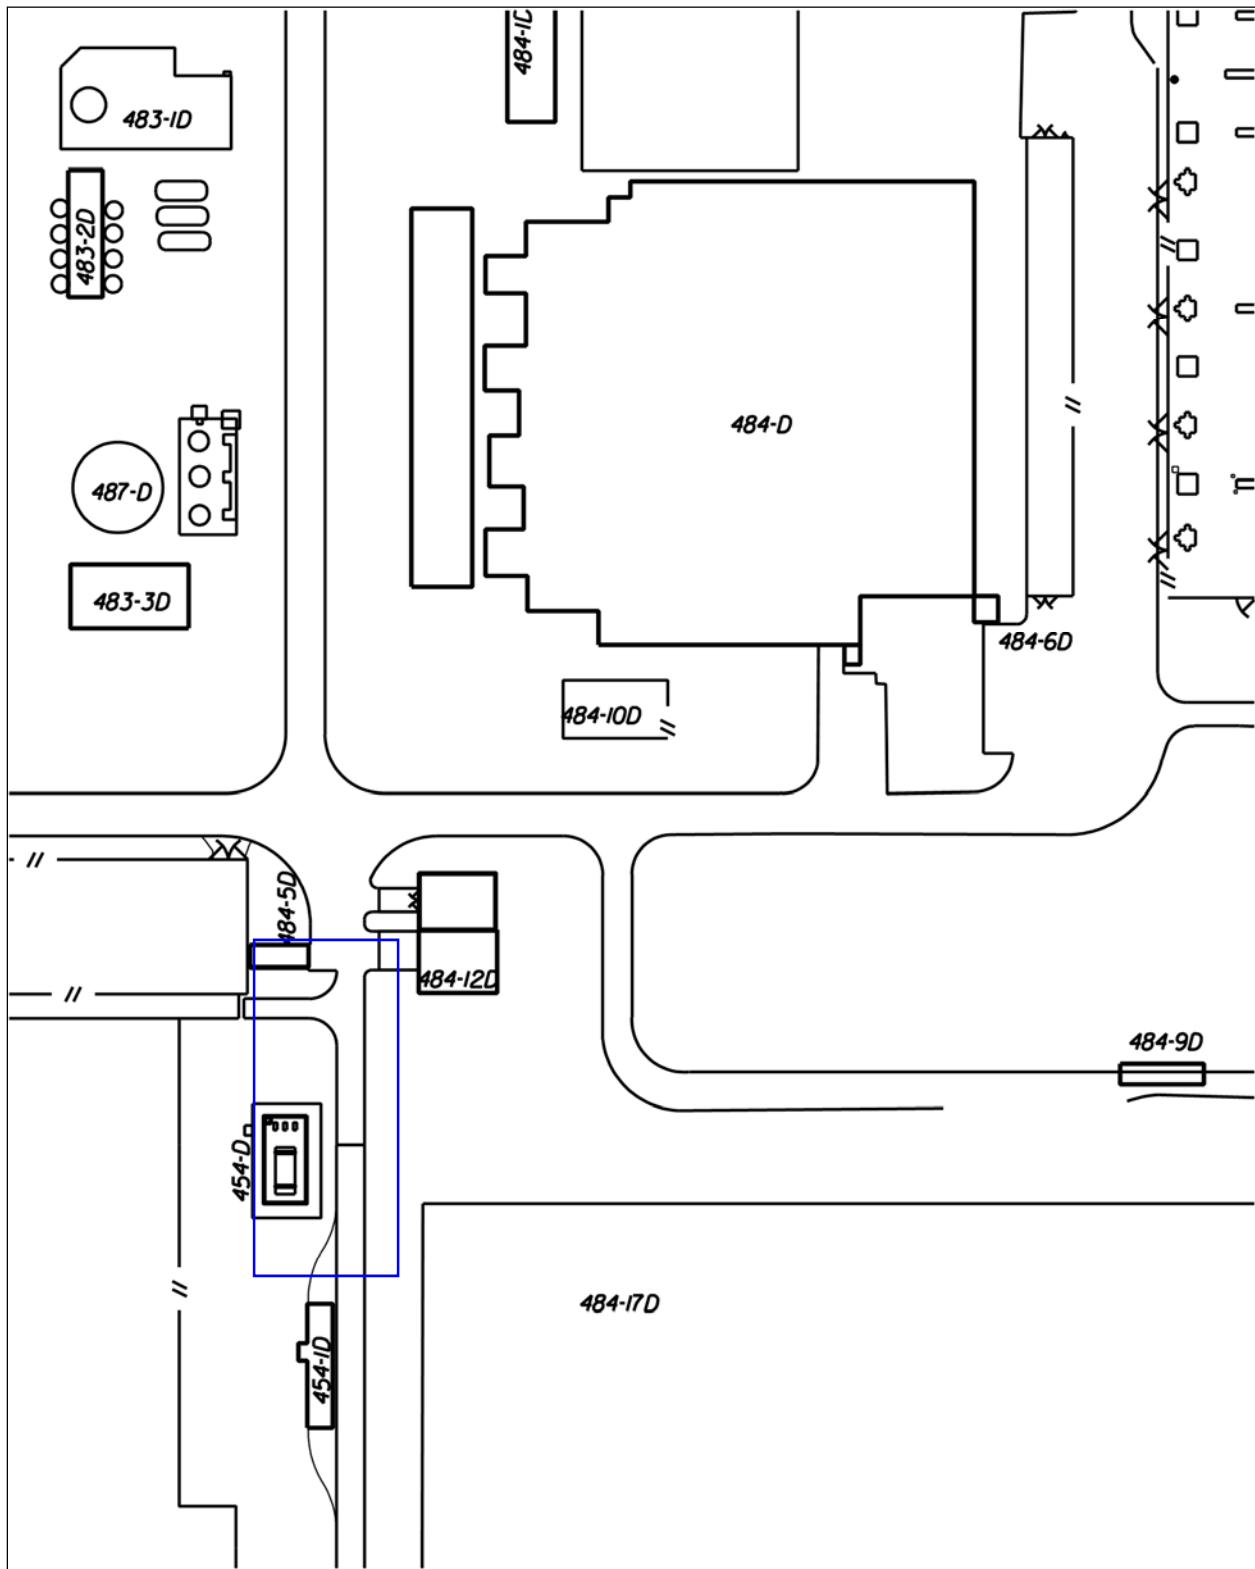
Buildings 454-D & 454-1D, D-Area Diesel Fuel Tank & Unloading Facility Layout
